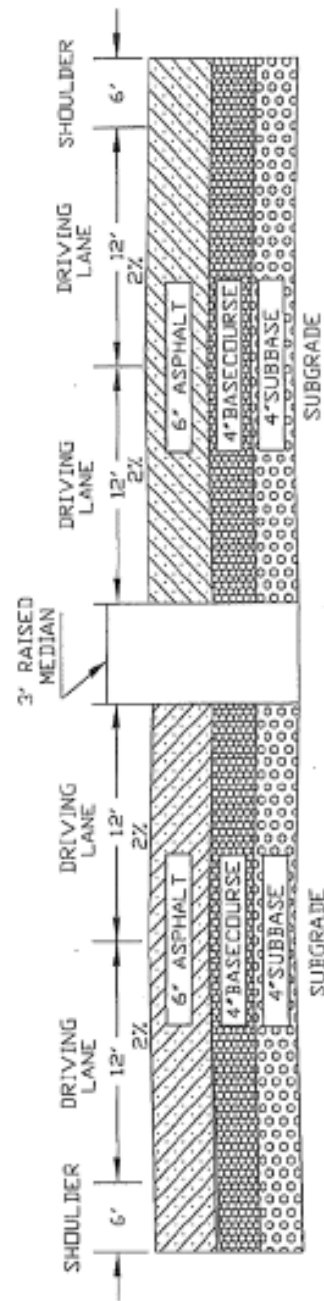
Typical Cross-Section of Four Lane a Arterial Road
